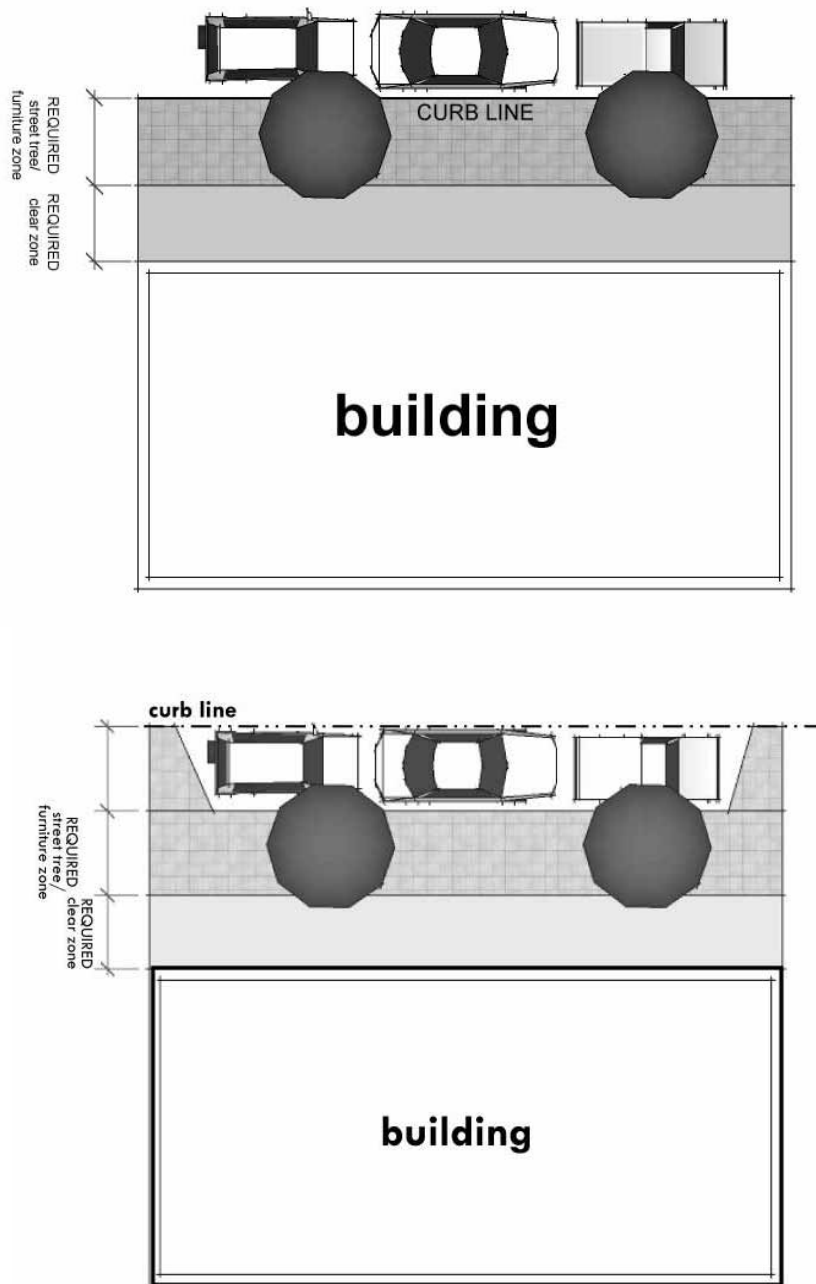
On-street parallel parking options; standard design (above) or a design inside the curb line (below).
